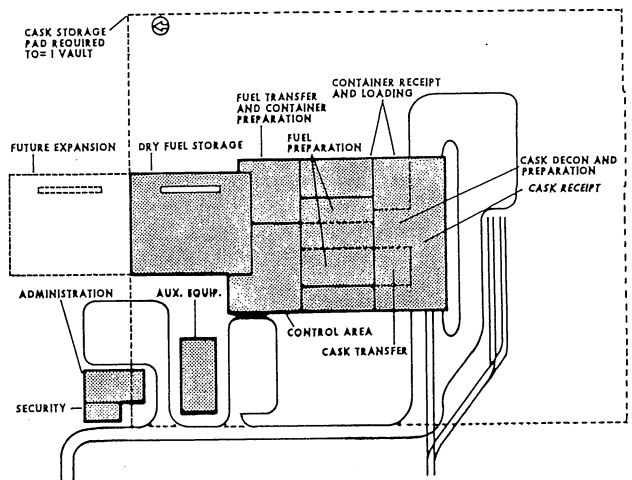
PLOT PLAN FOR 600 - 5000 MTU STORAGE.
